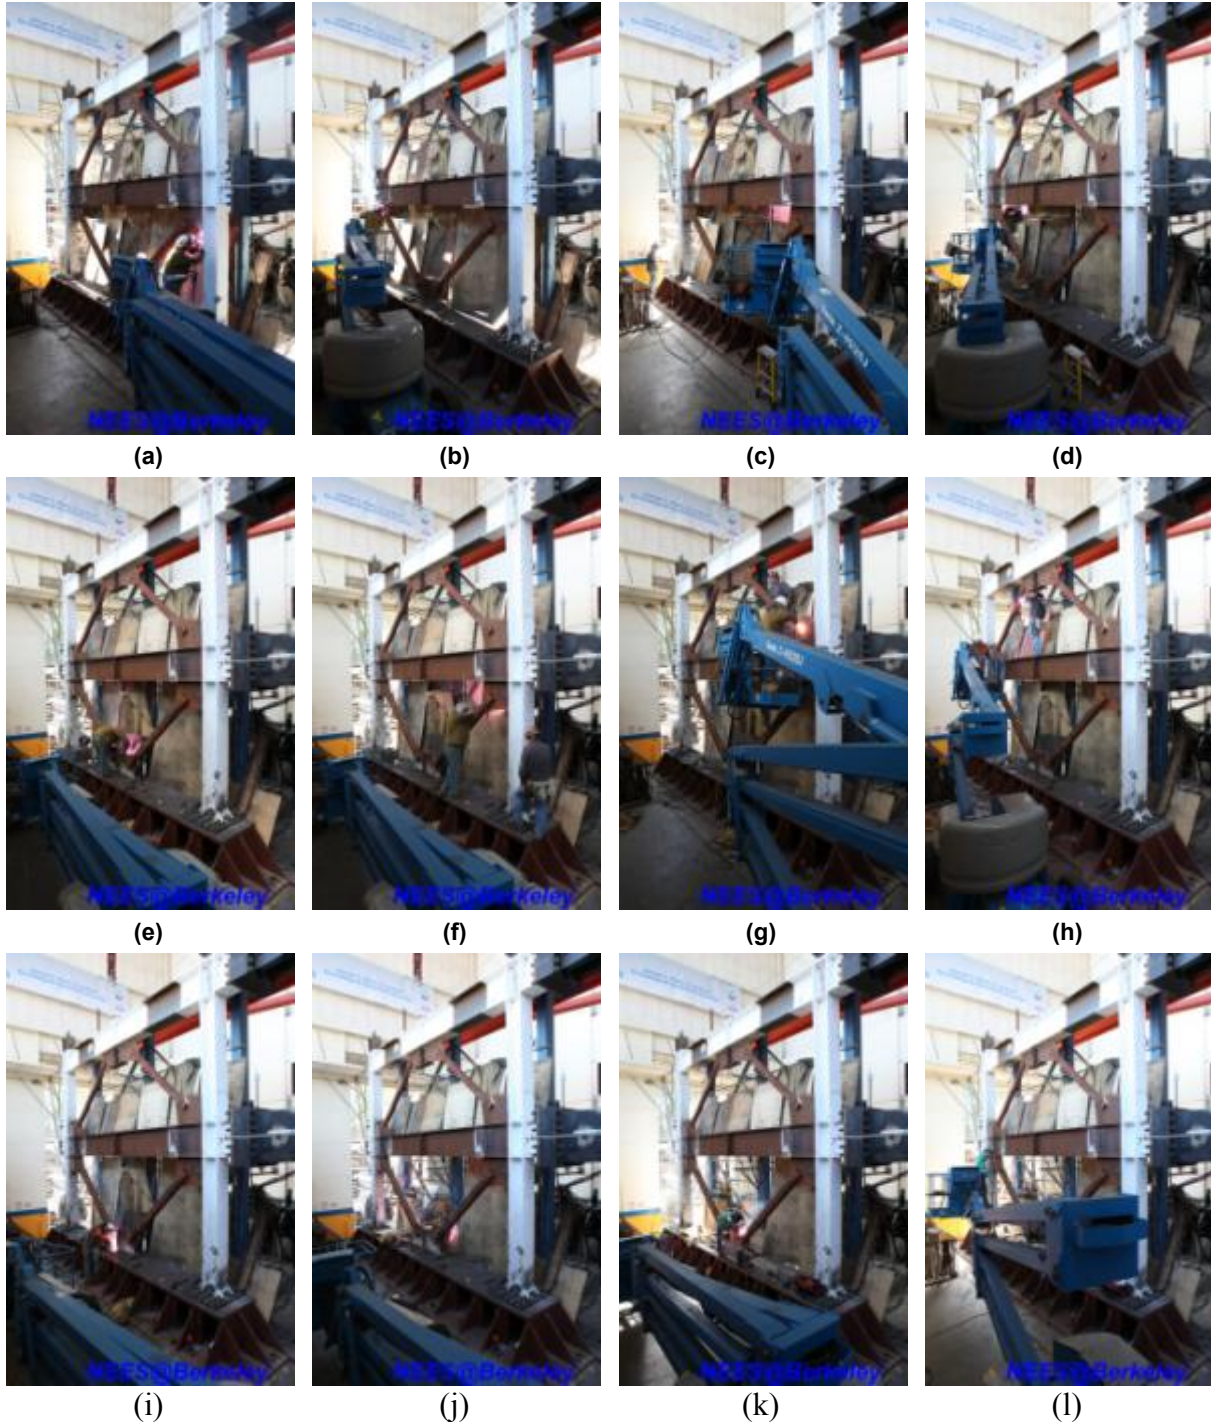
Specimen TCBF-B-4: key welding processes.
